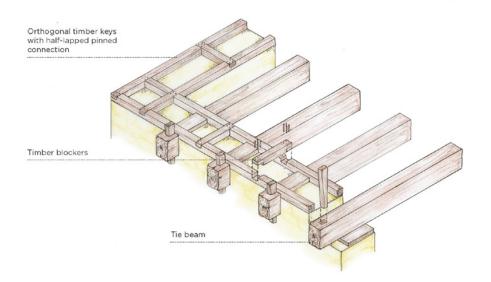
Addition of timber bond beams for improvement of the connection between wall and roof. Source: Alessandra Sprega for the J. Paul Getty Trust.
